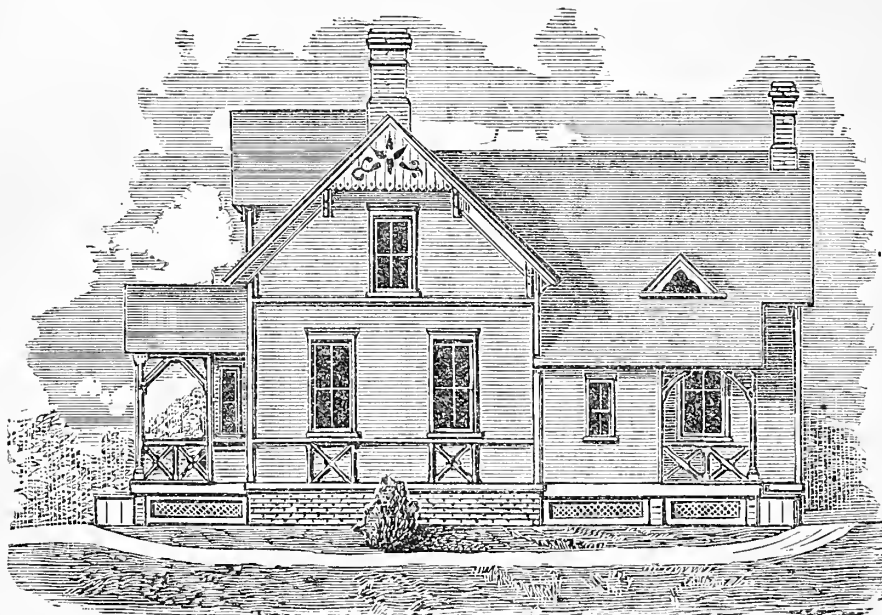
SIDE ELEVATION OF THE HOUSE.
